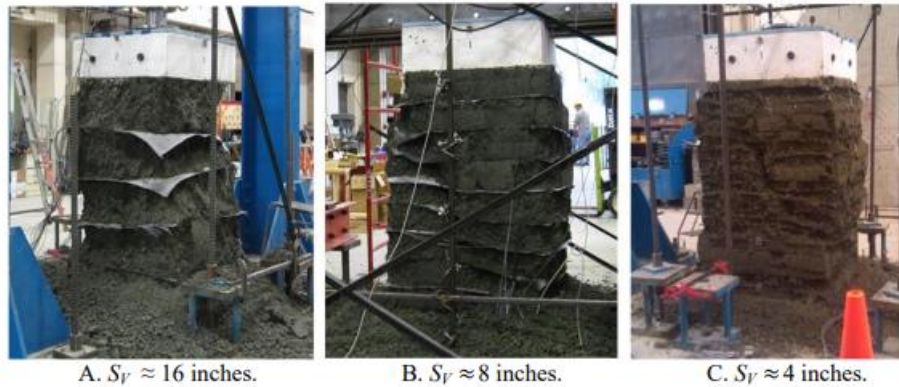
Failure behavior of GRS versus MSE as shown in tests conducted at reinforcement spacings of 16, 8, and 4 inches (M. Adams et al., 2018).
